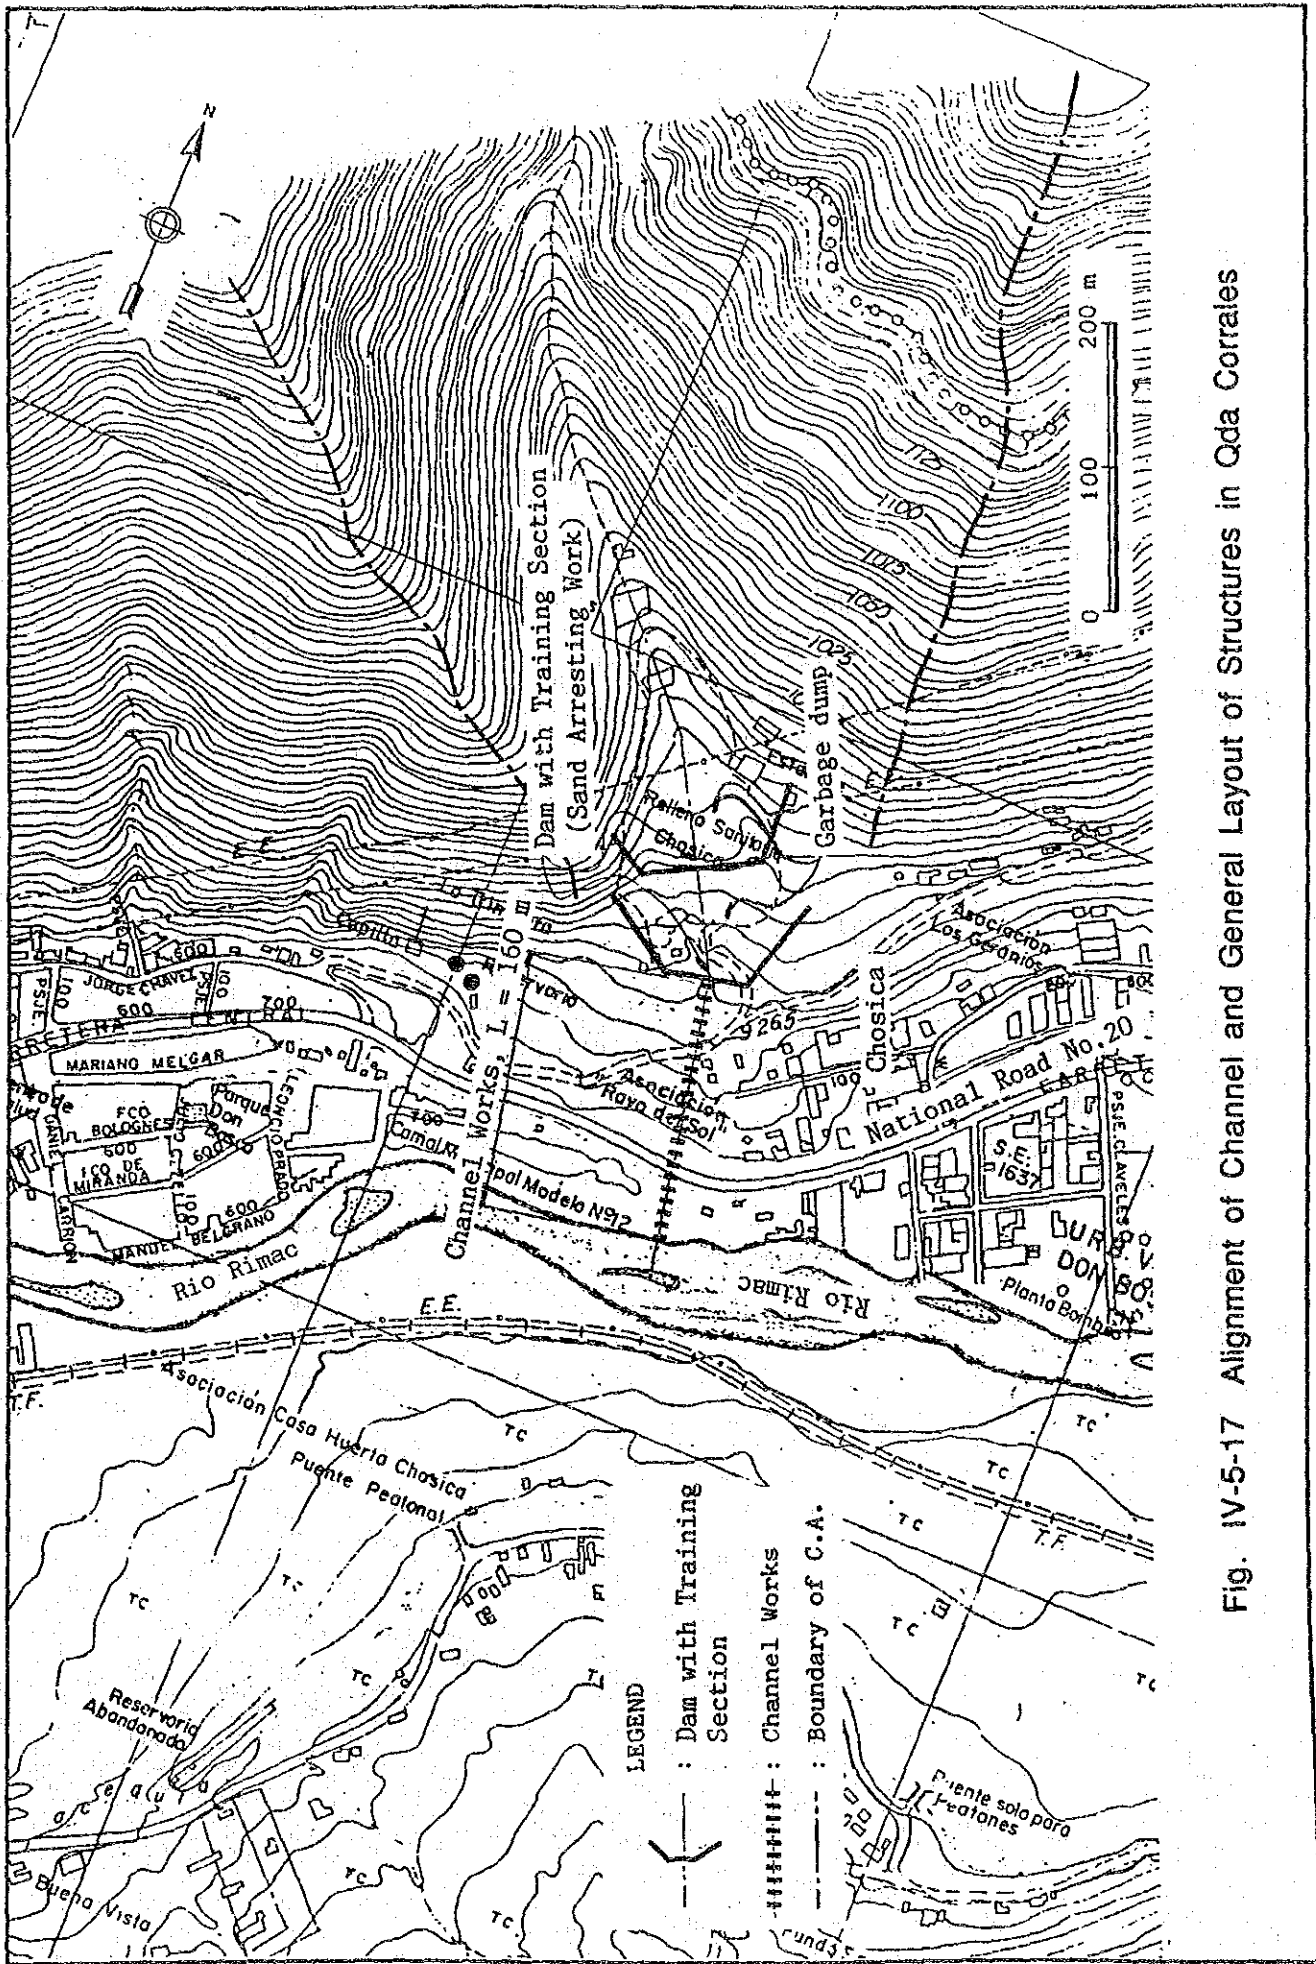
Alignment of Channel and General Layout of Structures in Qda Corrales
